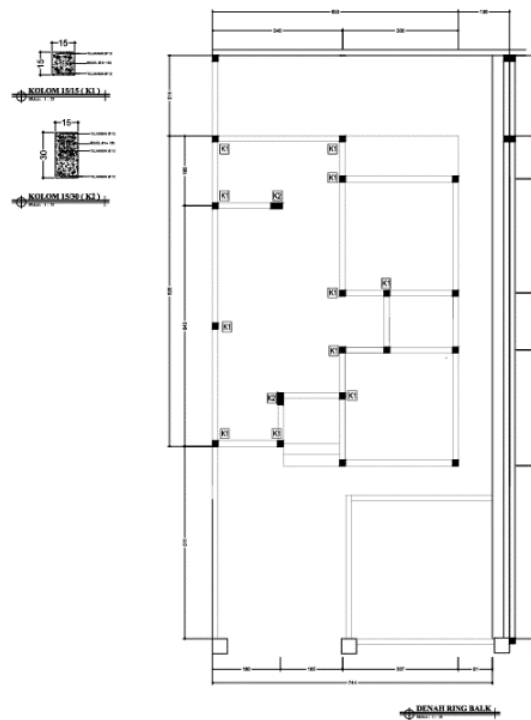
Column Structure Plan of Official Residence, Jl. Manukan Tengah
